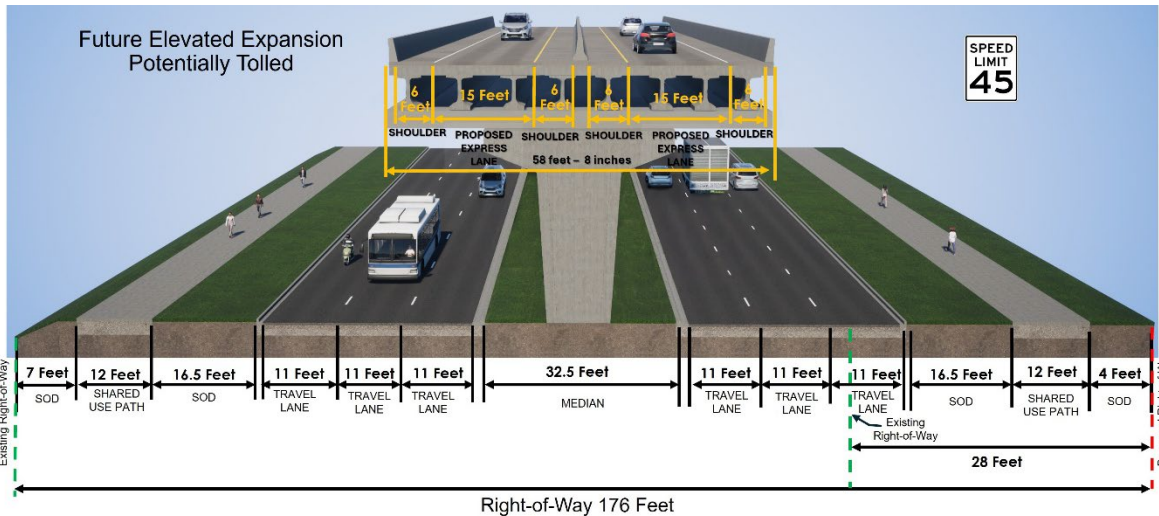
Preferred Alternative North of DeSoto Bridge to CSX RR Short Line
